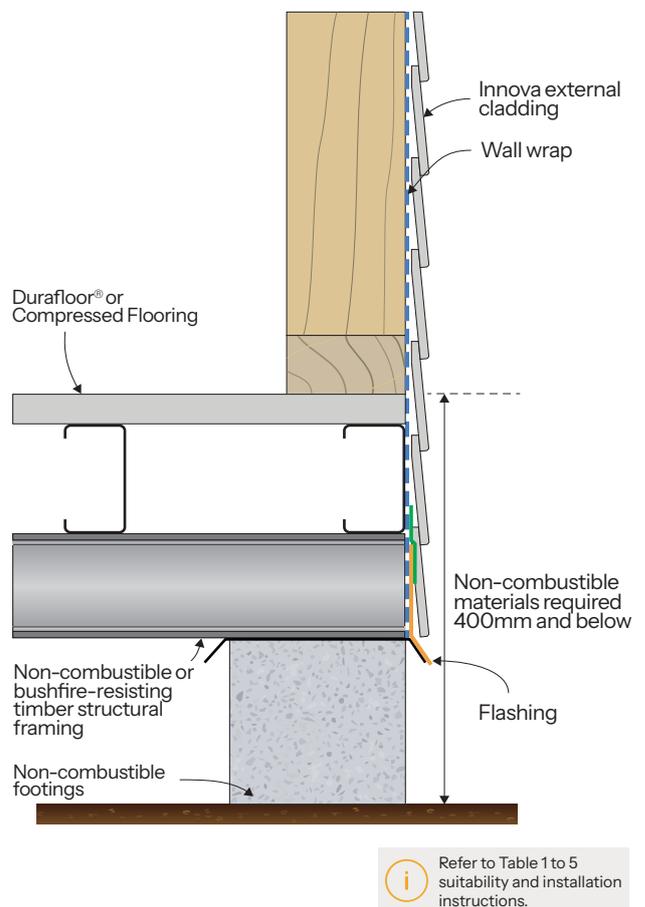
BAL 12.5 to BAL 29 Subfloor detail
